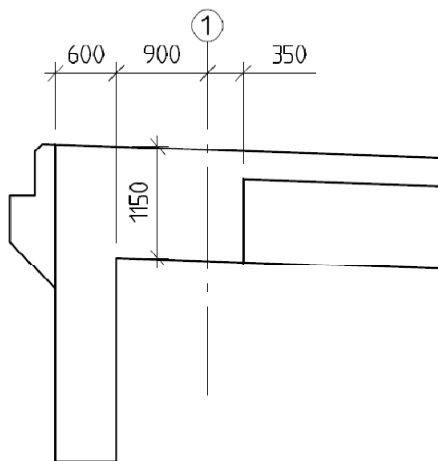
Detail of the transversal support beam of bridge P1514 at Brämhult over road 40. Adapted from Batman (2010).
